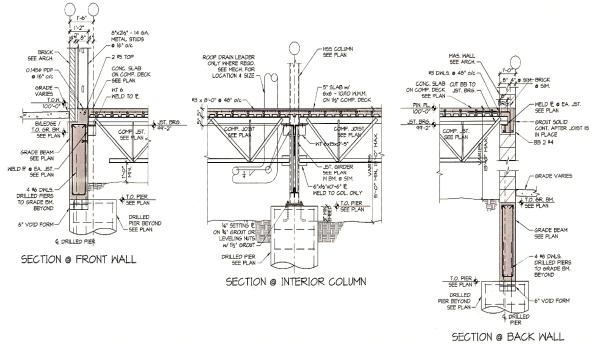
DESIGN DETAILS OF THE COMPOSITE STEEL JOISTS
